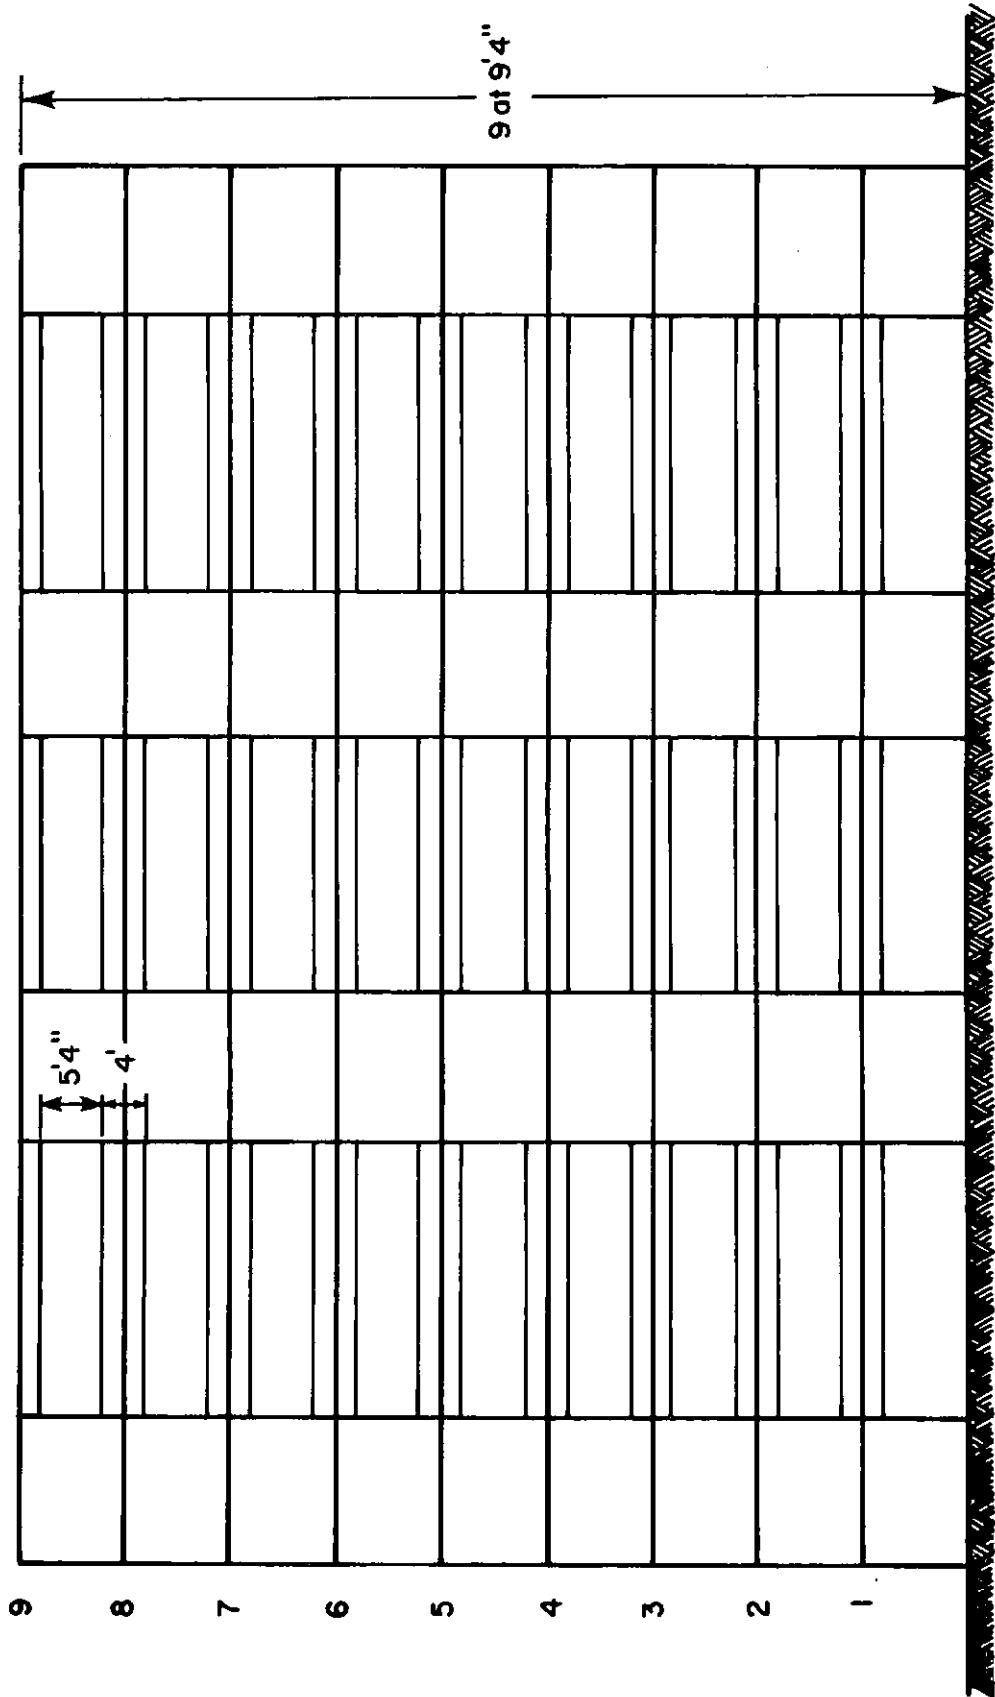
EXTERIOR FRAME (LONGITUDINAL DIRECTION)
